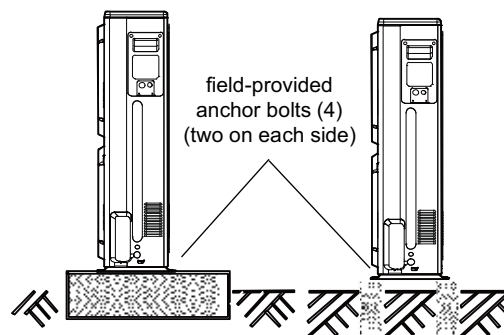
Outdoor Unit Typical Concrete Base Structure Design
